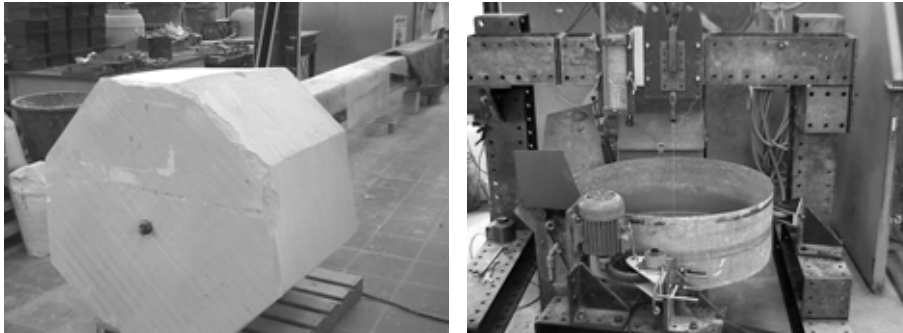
The corners of the AAC block were removed prior to milling (shown on the left) so it would fit in the milling set-up (shown on the right)
